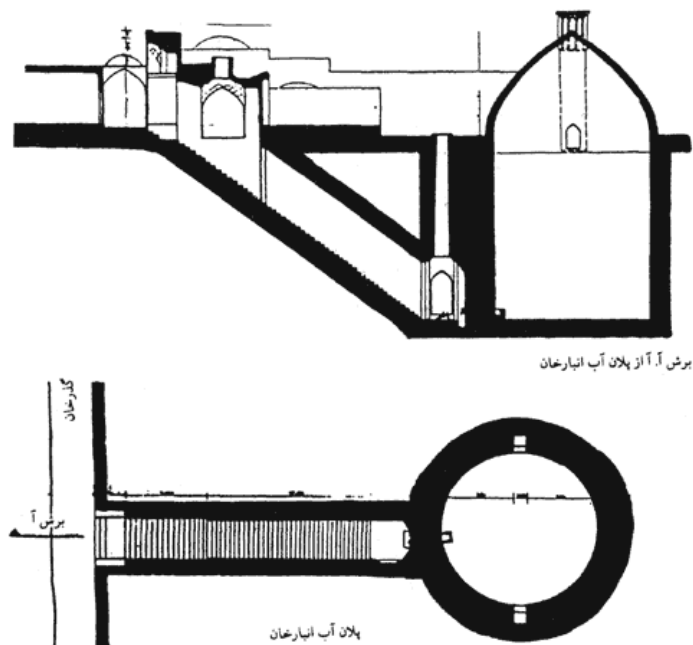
Section and plan view of Khan Ab-anbar (Source: (Ghoolabad 2010))
